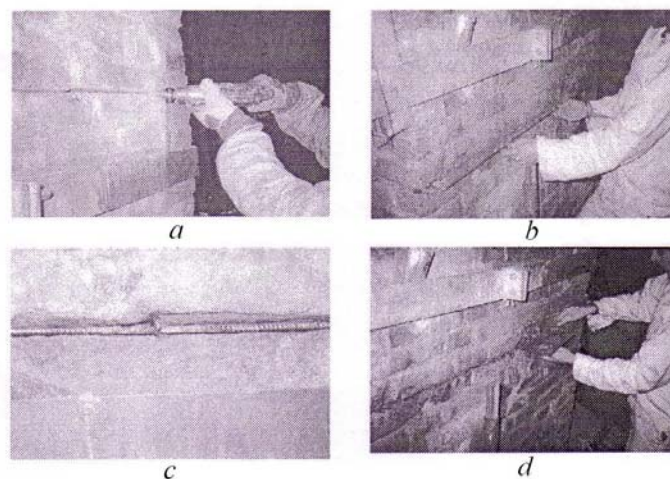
Steps for reinforced repointing strengthening intervention (Islam, 2008).
